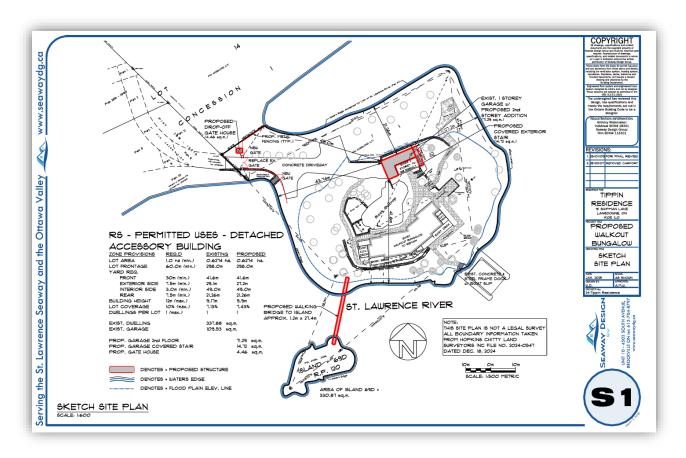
Site Plan and Proposed Development Layout for 91 Shipman's Lane
